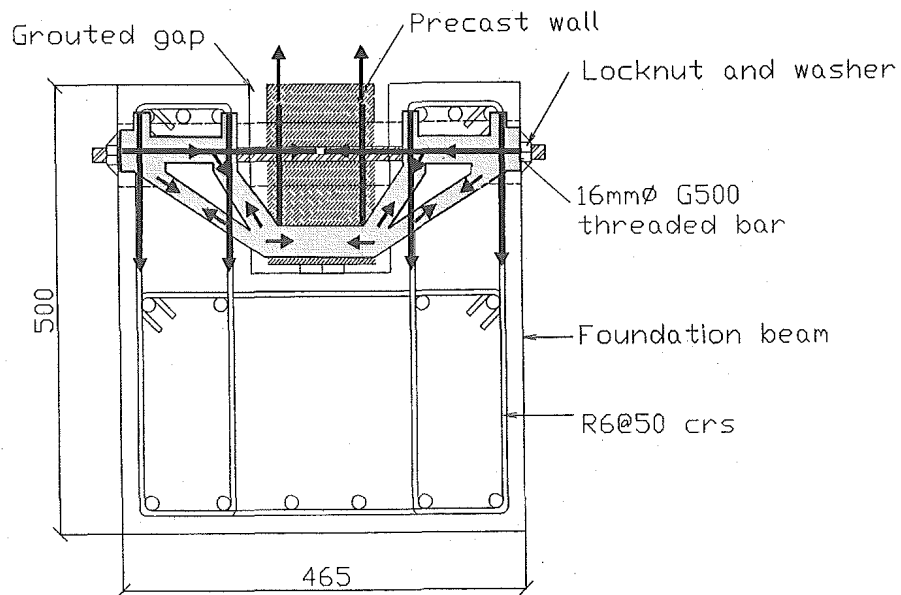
Wall panel-foundation beam internal force-flow in the transverse direction.
